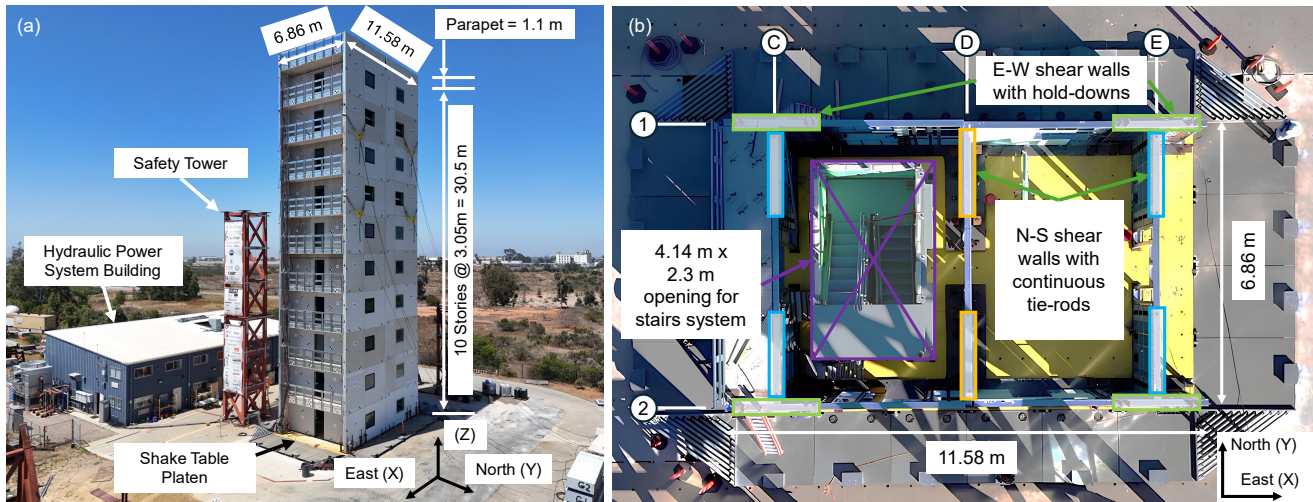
CFS10 building (a) isometric view and (b) plan view
